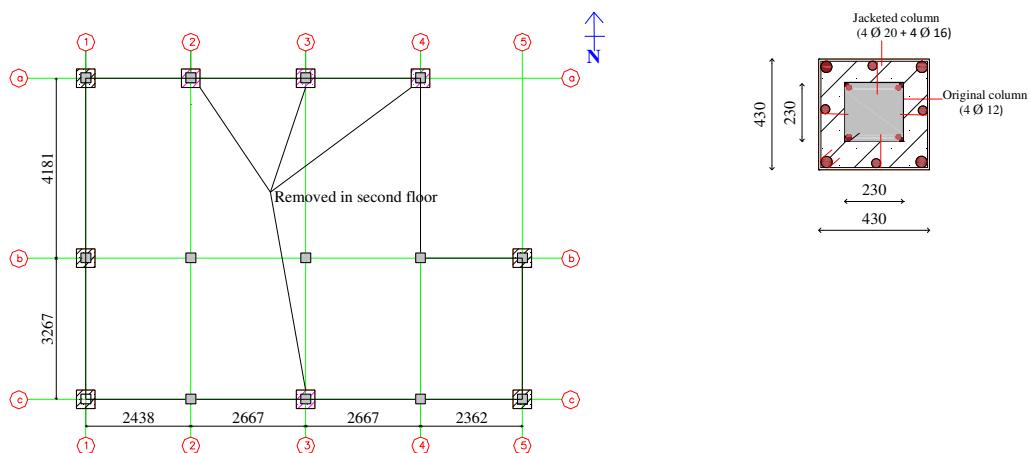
Jacketing plan layout and reinforcement details of new jacketed column in the CCP1 building (all dimensions are in mm)
